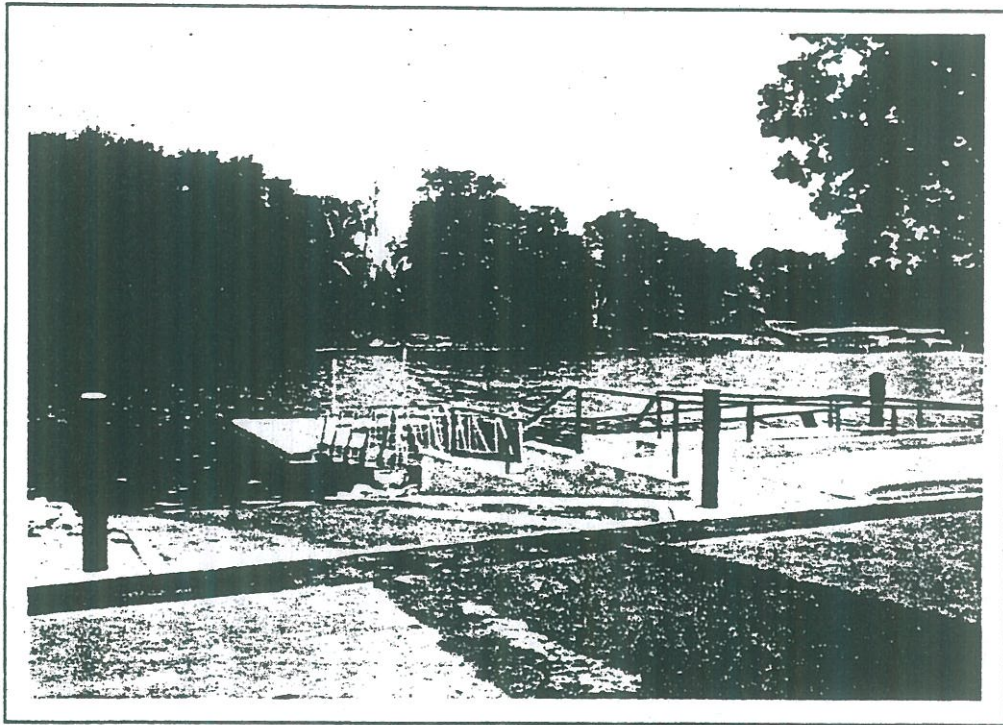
Boat access facility, Kesler Park, Quincy, IL
